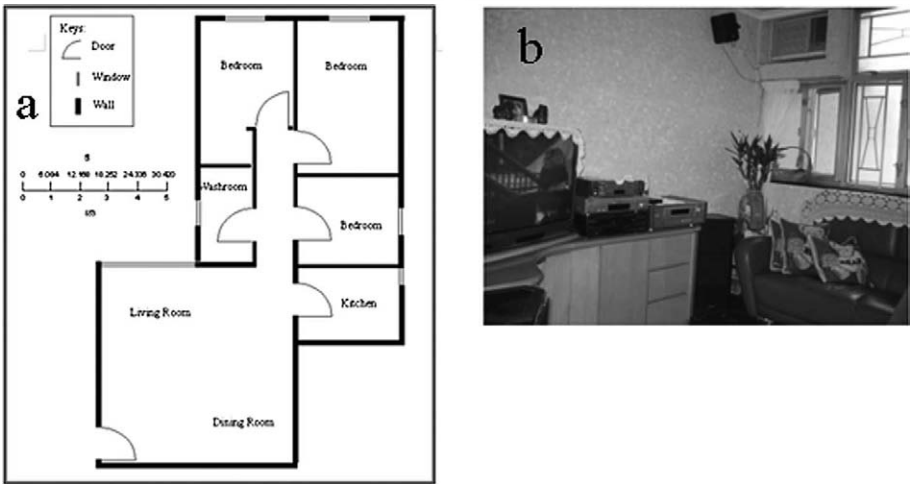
(a) Floor plan and (b) photo of the site 2 apartment.
